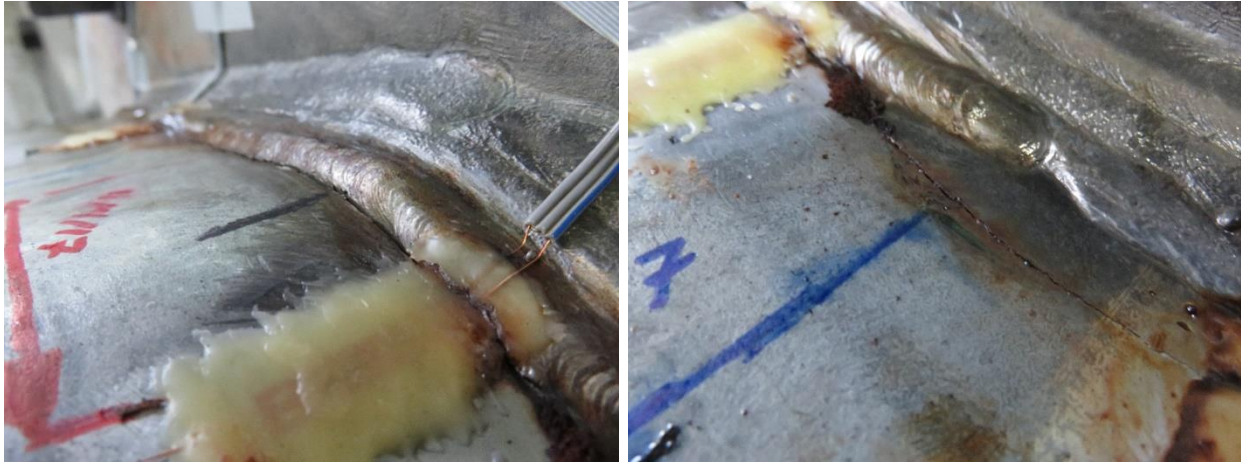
Weld-Repaired Specimen 33-3-12-TX-A2 – Bend 5 Following the Fatigue Test: Close-up View
